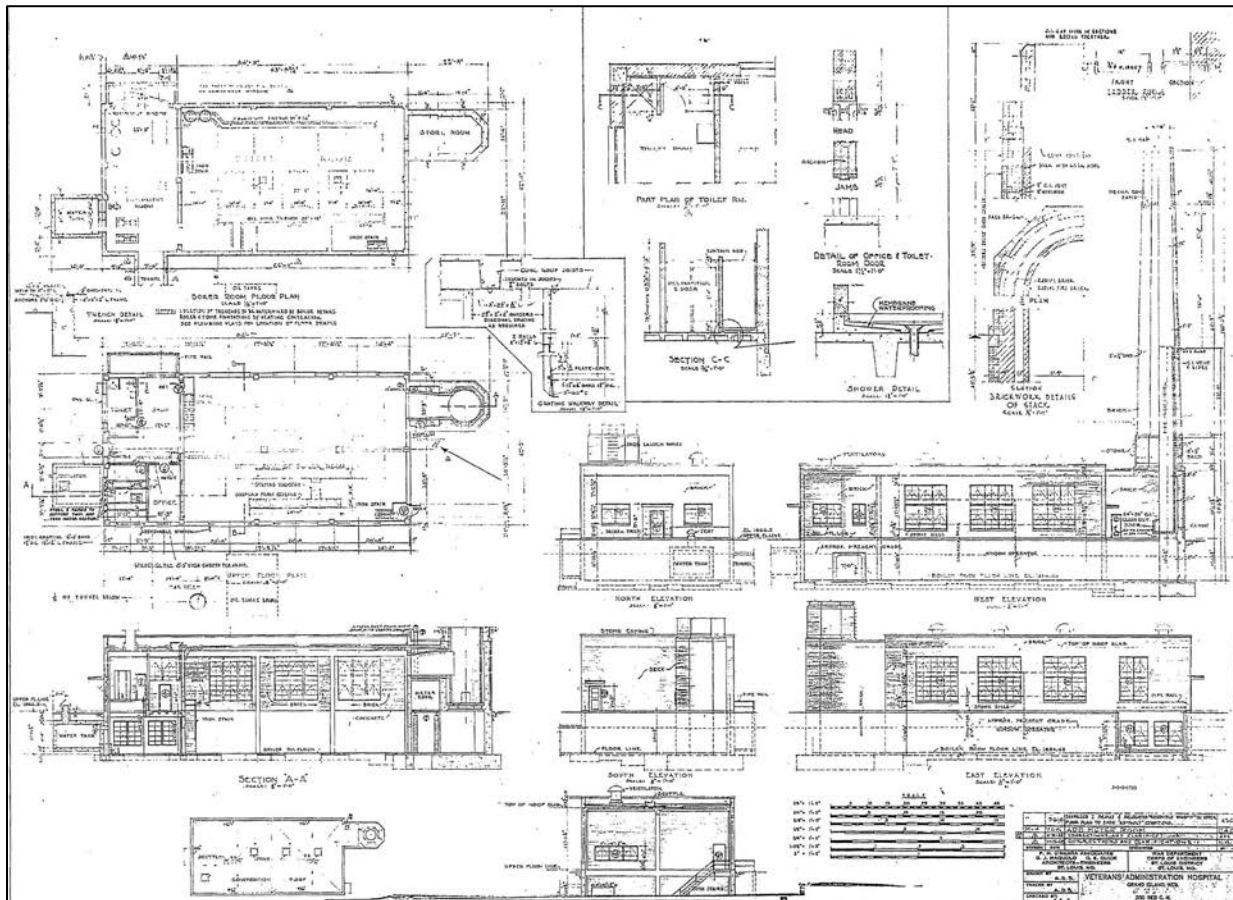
Plans and elevation drawings for the boiler house (Building #7) (VA).
